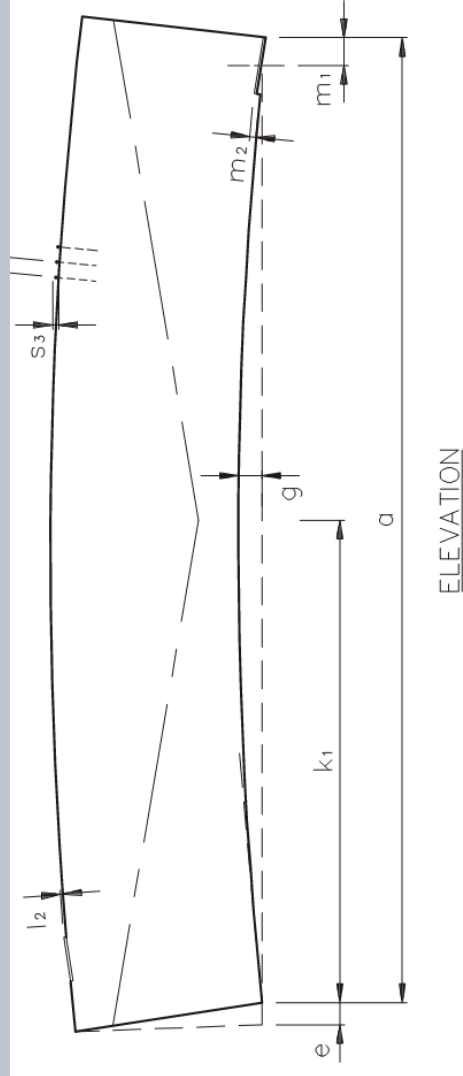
I-Beam (Girder) or Bulb-Tee Girder
